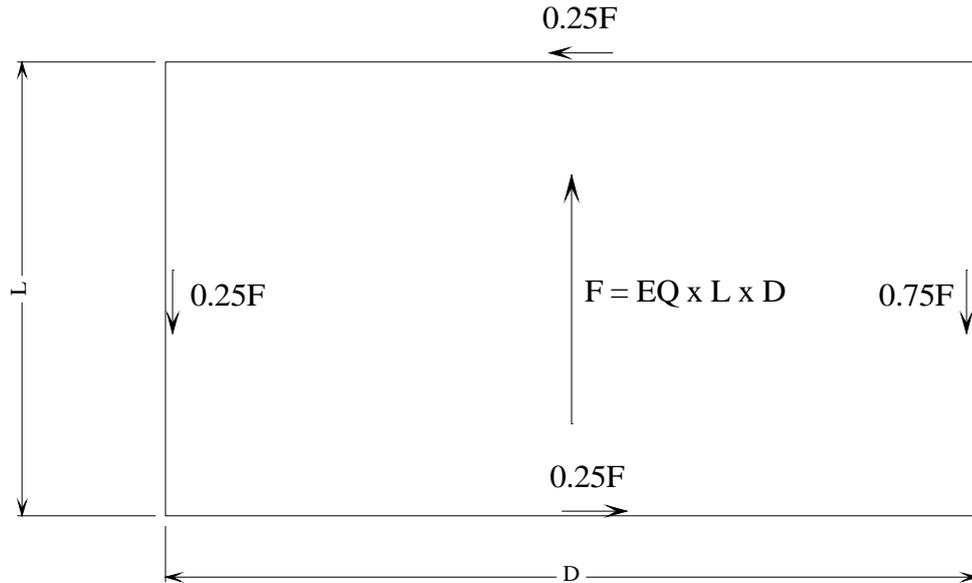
Maximum forces for the proposed bracing requirements for walls under diaphragms.
